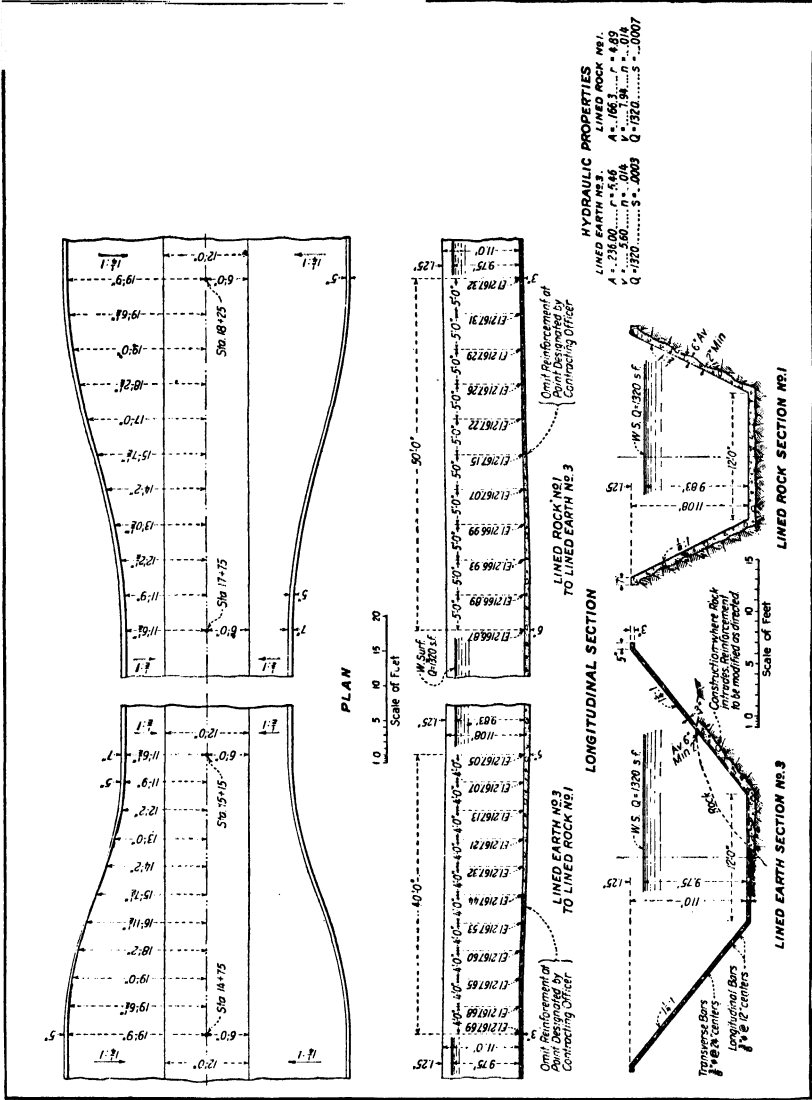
Warped transition sections, Kittitas Main Canal, Yakima project, Washington.
